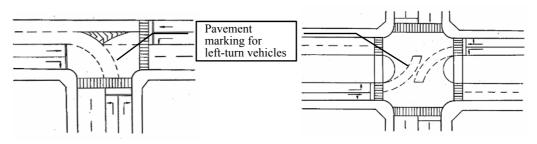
(1) Standard Layout for Pavement Marking Where Lane Operation to be Altered
